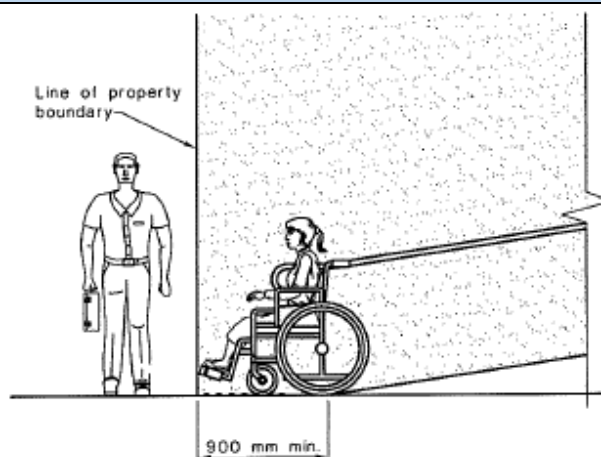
(A) RAMP HANDRAILS—EXAMPLES OF HANDRAIL TERMINATIONS
